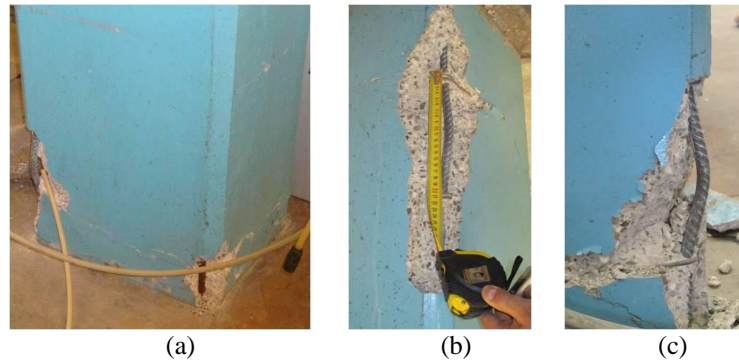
Cavezzo, RC column, (a) concrete spalling, (b) stirrup spacing equal to 20cm, (c) longitudinal bar buckling; (Parisi et al., 2012).
